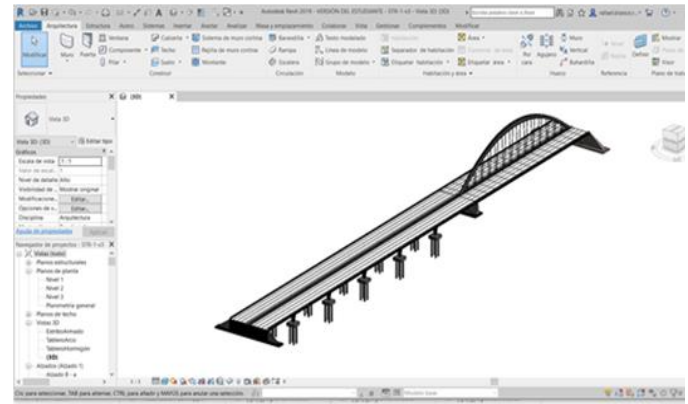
Navisworks ® model of the arch bridge, and the beam bridge.
